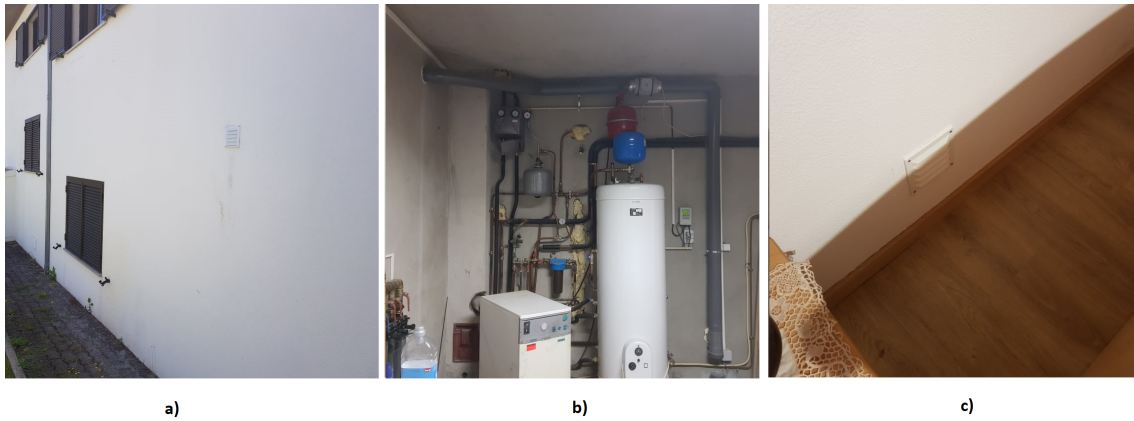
Ventilation system installation in the ground floor room - a) outdoor installation b) Installation of tubes and fan c) indoor installation
